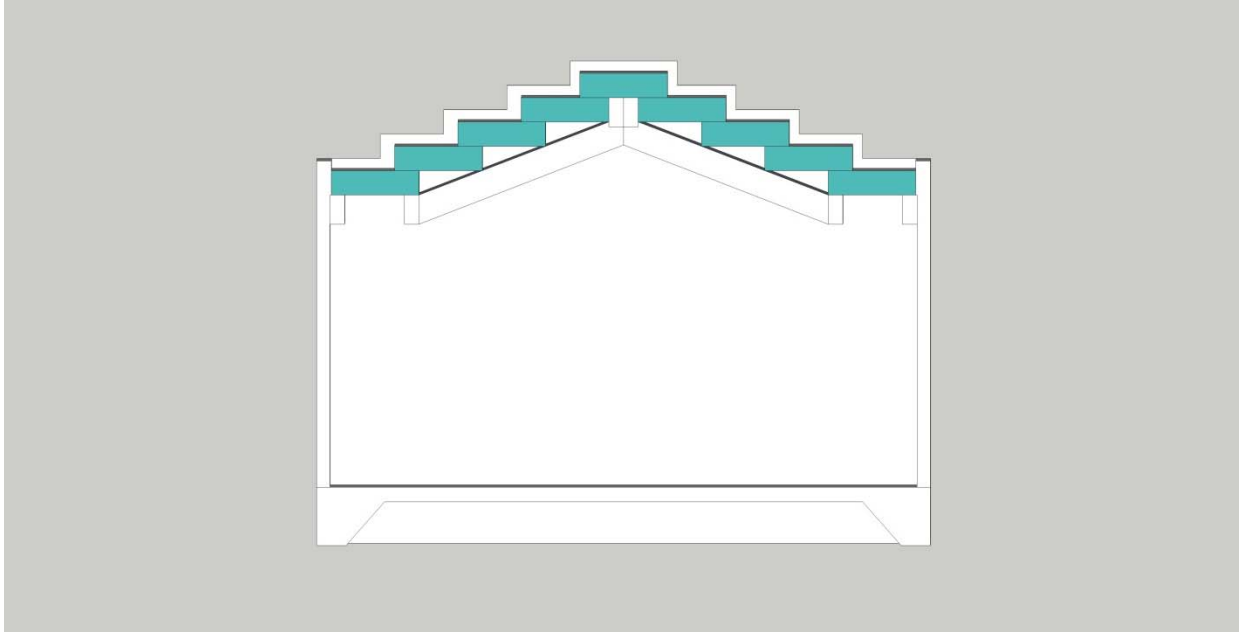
Sloped Green Roof and Roof Pond Construction Diagram
